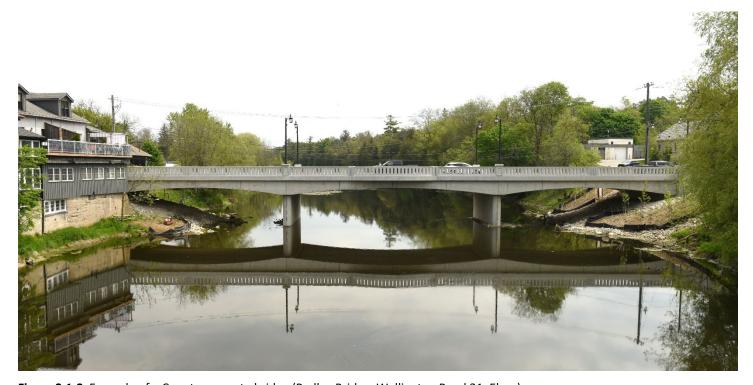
Example of a County concrete bridge (Badley Bridge, Wellington Road 21, Elora).
